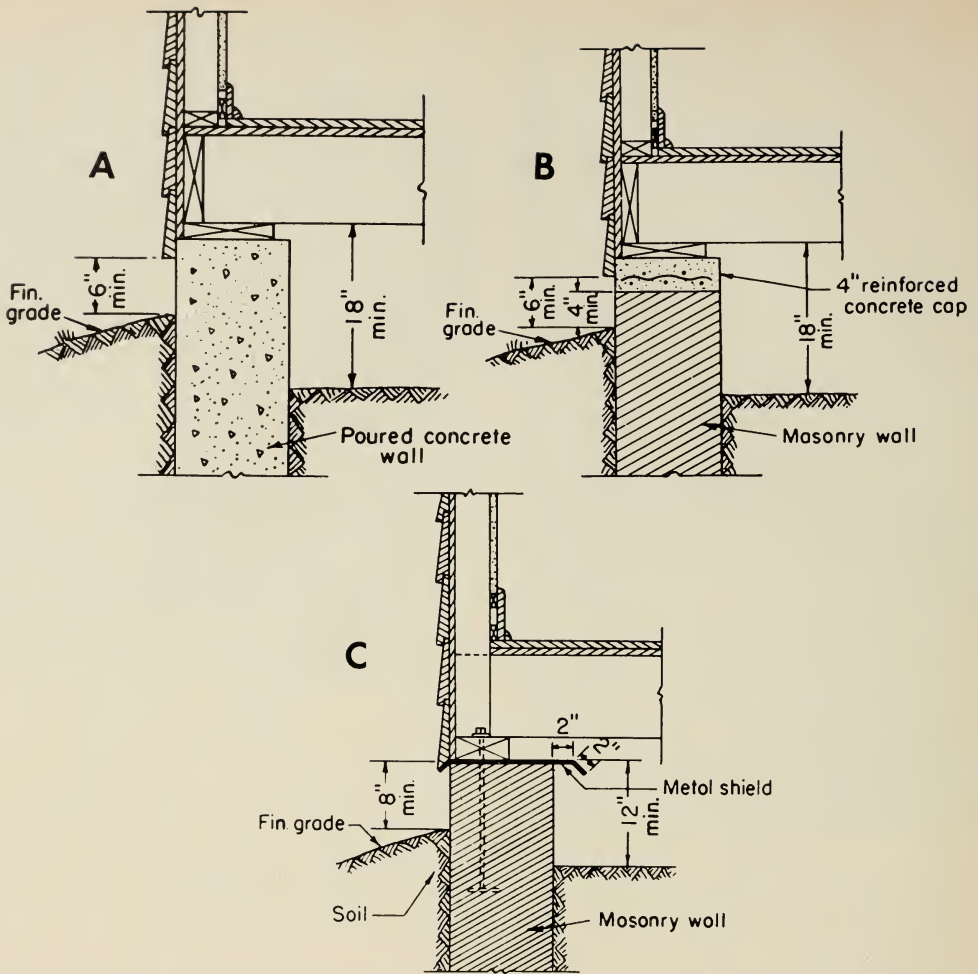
Three types of foundation wall: A. poured concrete; B. masonry with a 4-inch reinforced concrete cap; C. masonry with metal termite shield. (After St. George *et al.*, 1963).
